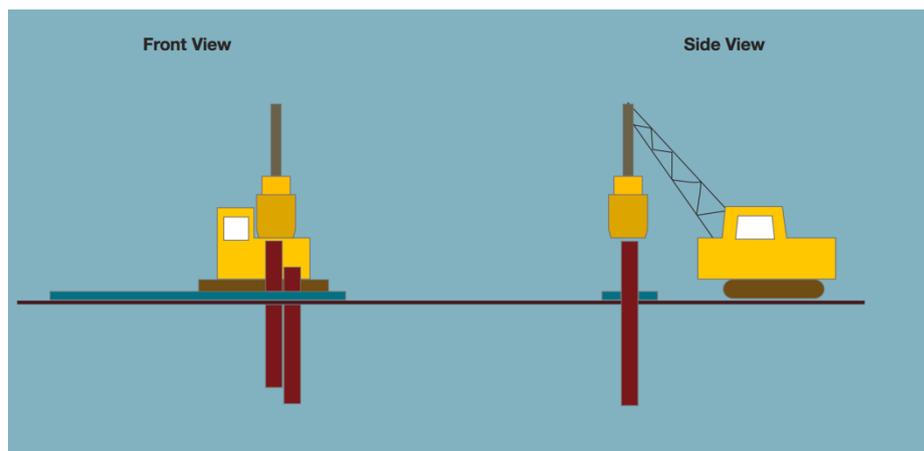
Installation of sheet pile (Installation of Retaining Wall – Sheet Pile Wall, n.d.).
